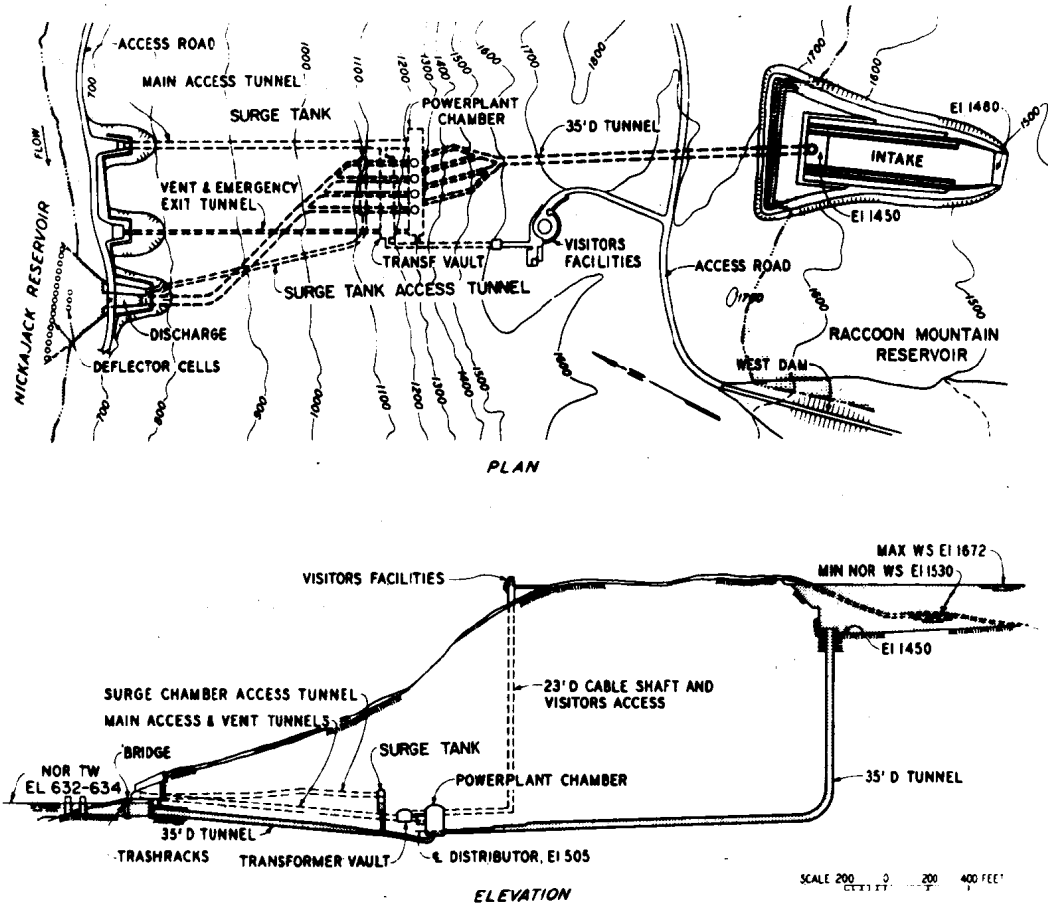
GENERAL PLAN OF RACCOON MOUNTAIN PUMPED-STORAGE PLANT
